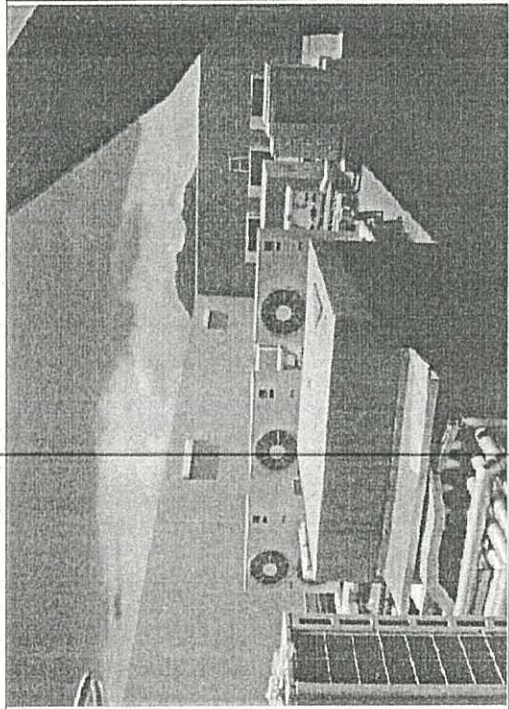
chiller system in form of air conditioning at the vent building of the north portal of Tai Lam Tunnel
